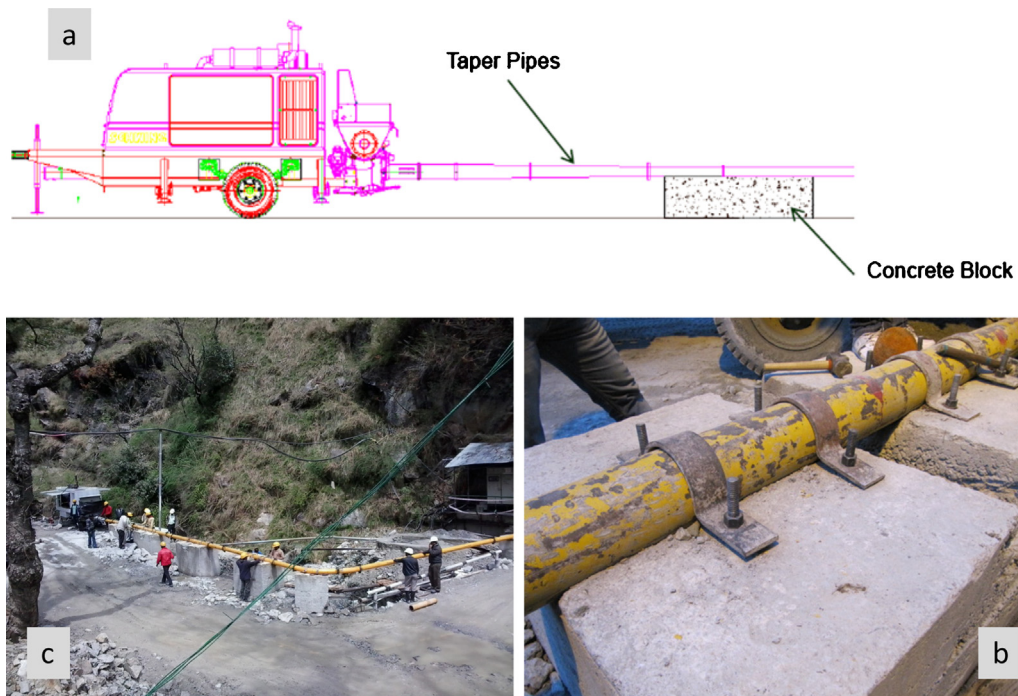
Pipe support at pump outlet (a and b) and overall layout near the pump (c).
